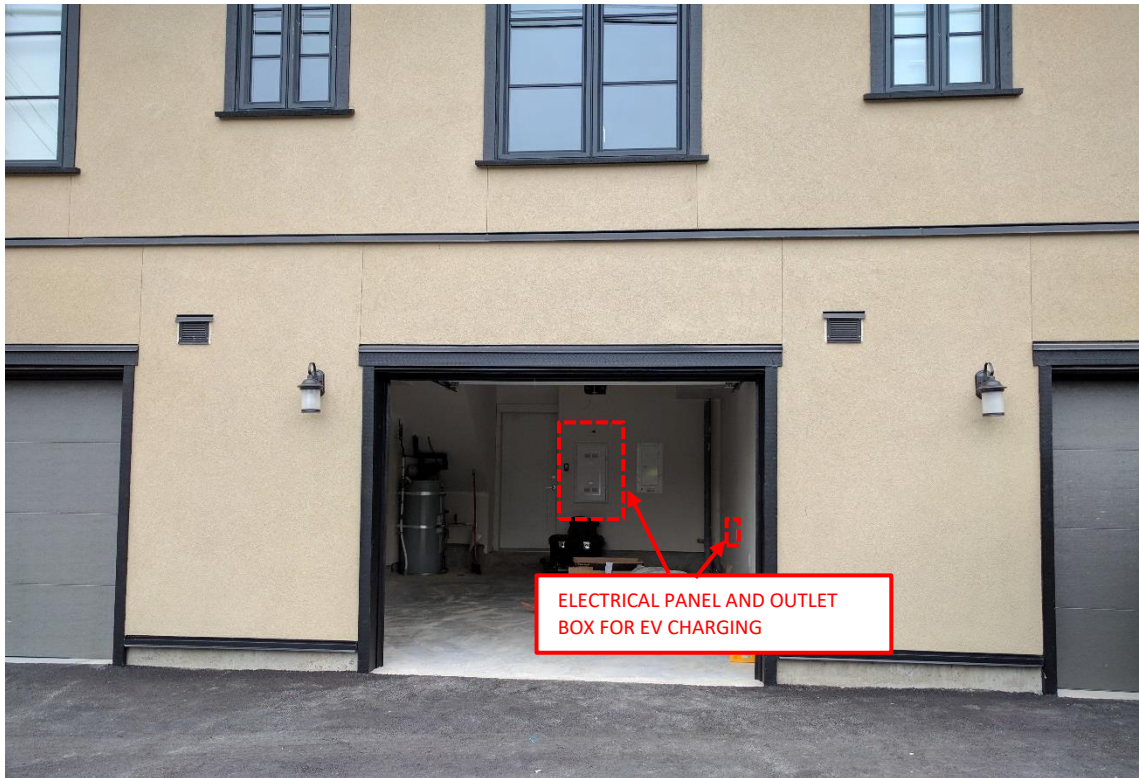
A view of one of the parking stalls fitted with EV charging infrastructure.
